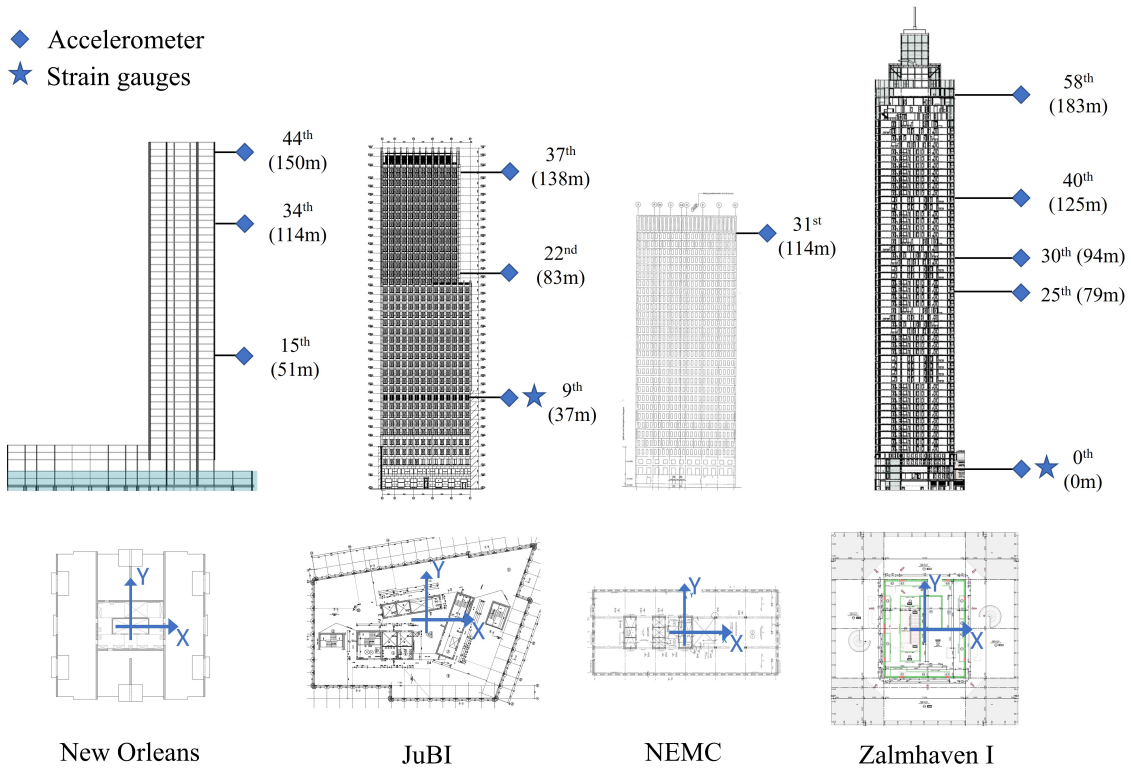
Buildings investigated in the HiViBe project: (a) New Orleans, (b) JuBi tower, (c) New Erasmus Medical Center (NEMC), and (d) Zalmhaven I.
